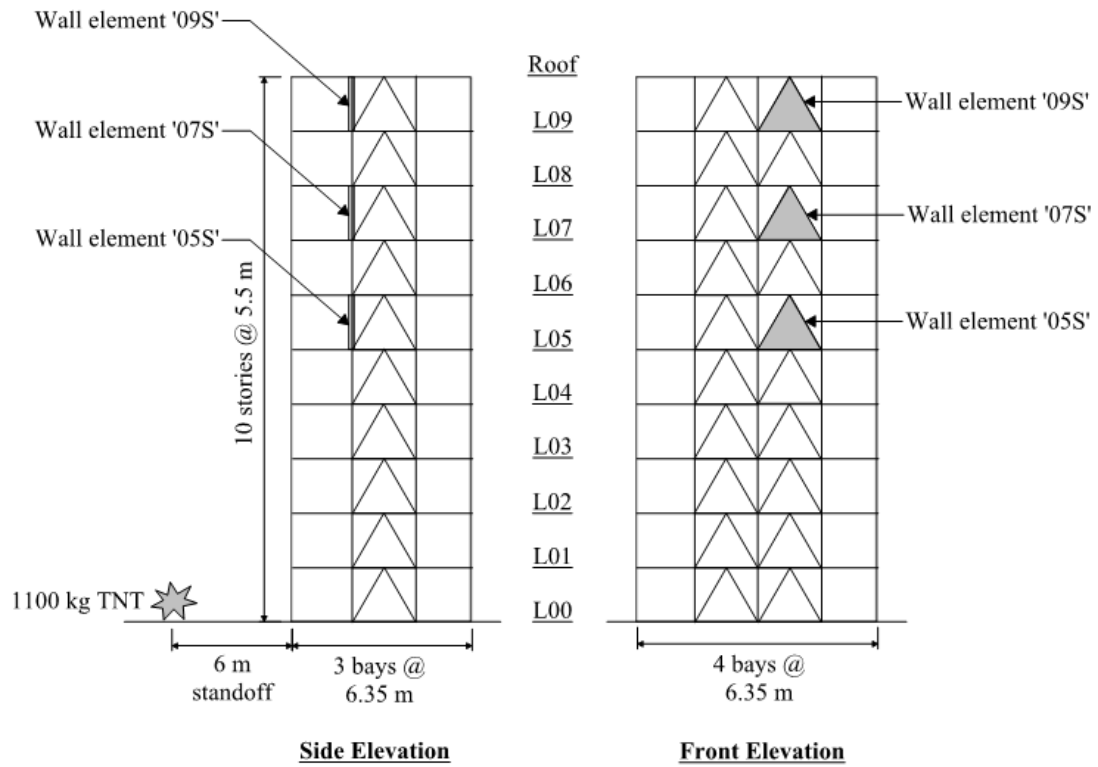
Imaginary 10-story building with steel plate wall elements in-plane of braced frame.
